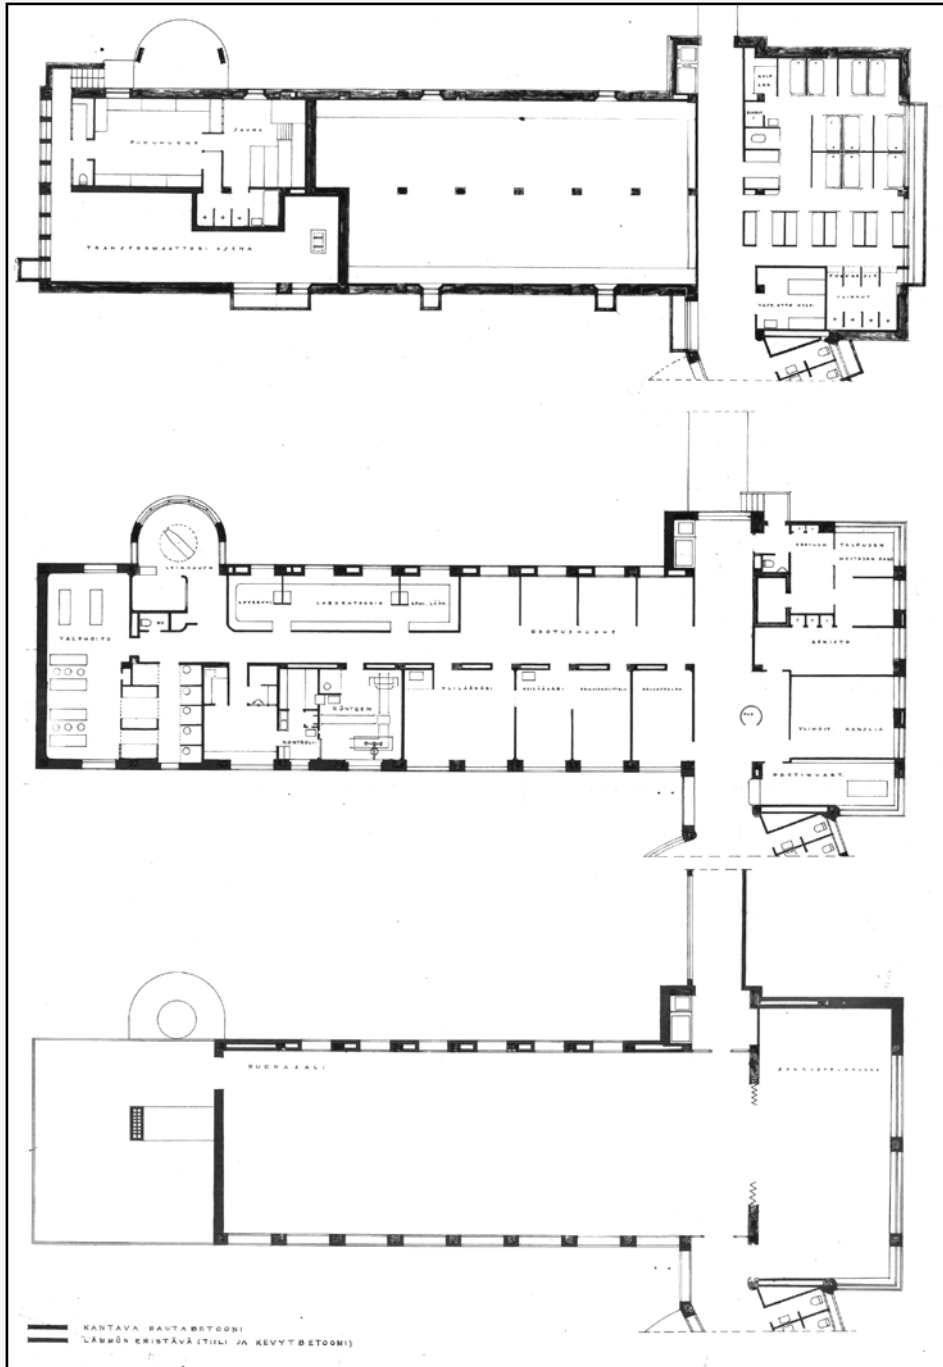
Master drawing of the B wing plans, April 1930. The top image shows the basement floor plan. The ground floor (in the middle) houses treatment rooms and surgeries, doctors' offices and the operating theatre. The plan of the first floor (bottom) shows the dining hall and lounge. There was access from the dining hall to the kitchen wing via a footbridge. Drawing No. 50-72a. The drawing has been edited. AAM.
